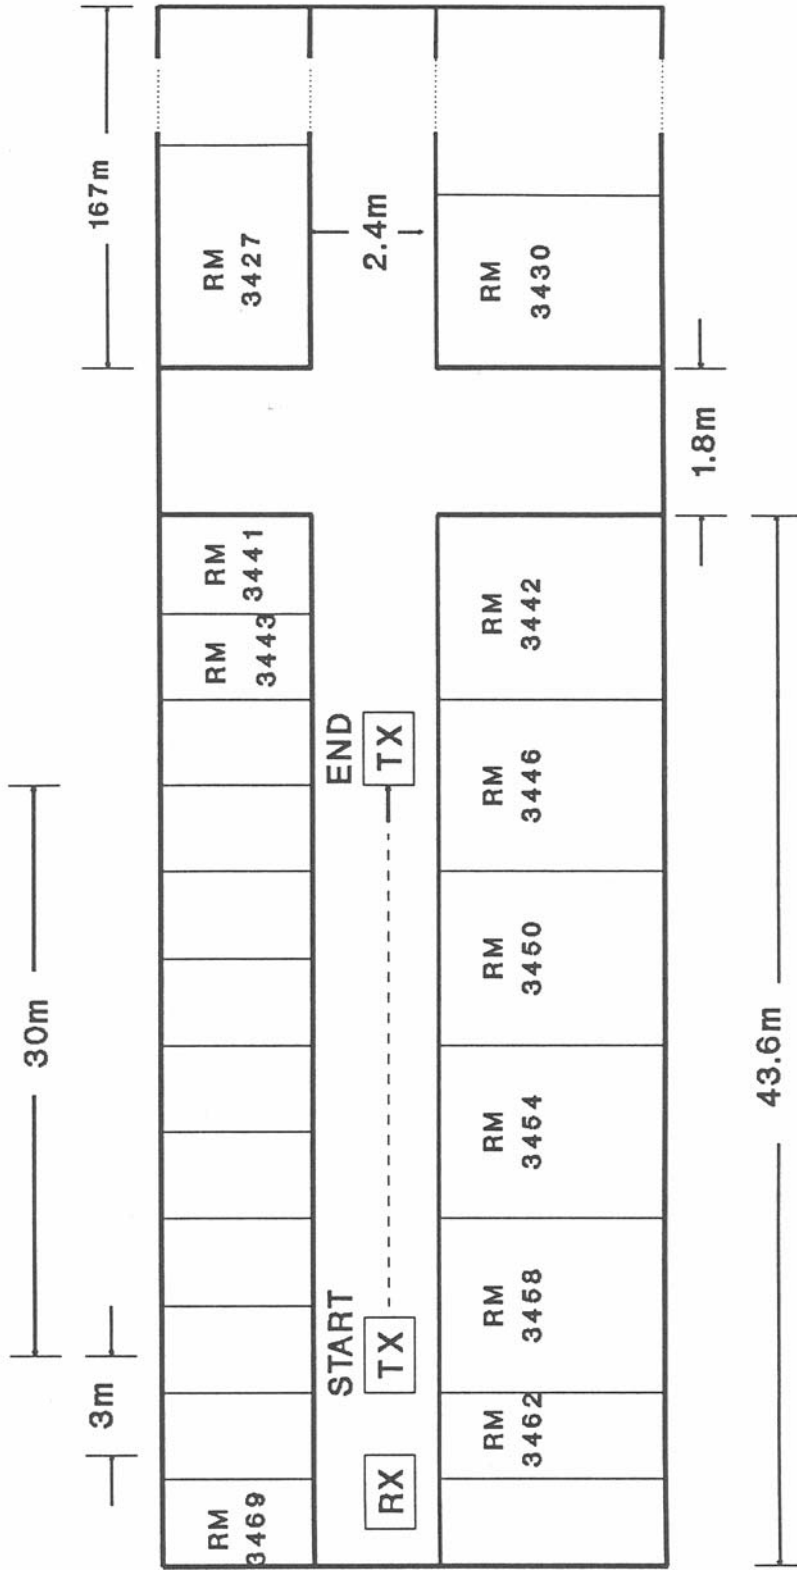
Site #1 floor plan and data profile, Wing 4 hallway, Radio Building, not to scale.
